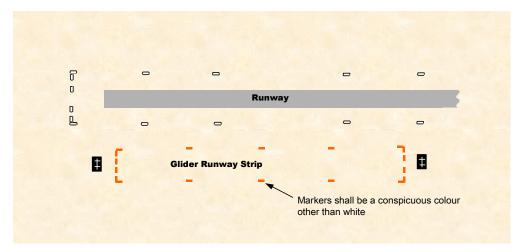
Glider runway strip outside an existing powered aircraft runway strip
